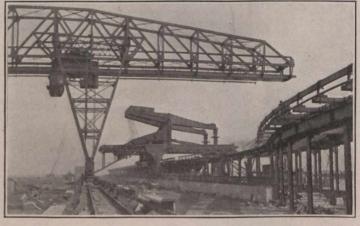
New C.P.R. Coal Handling Plant on Island no. 1.
